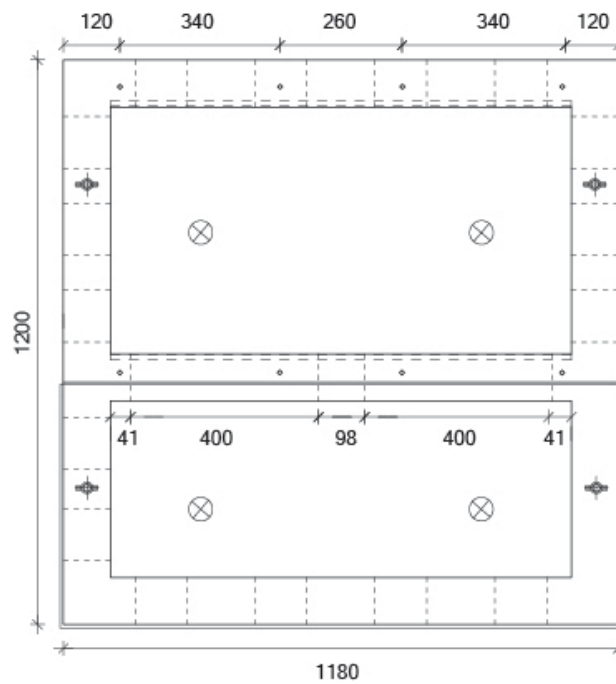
Indicative drawing for triple cabinet's concrete foundation, top view (mm)
